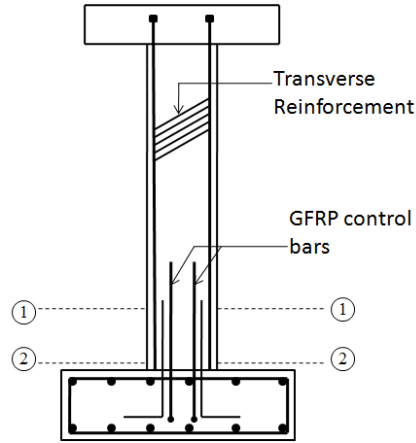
Typical details of bridge pier with GFRP control bars (Not all bars are shown for clarity)
